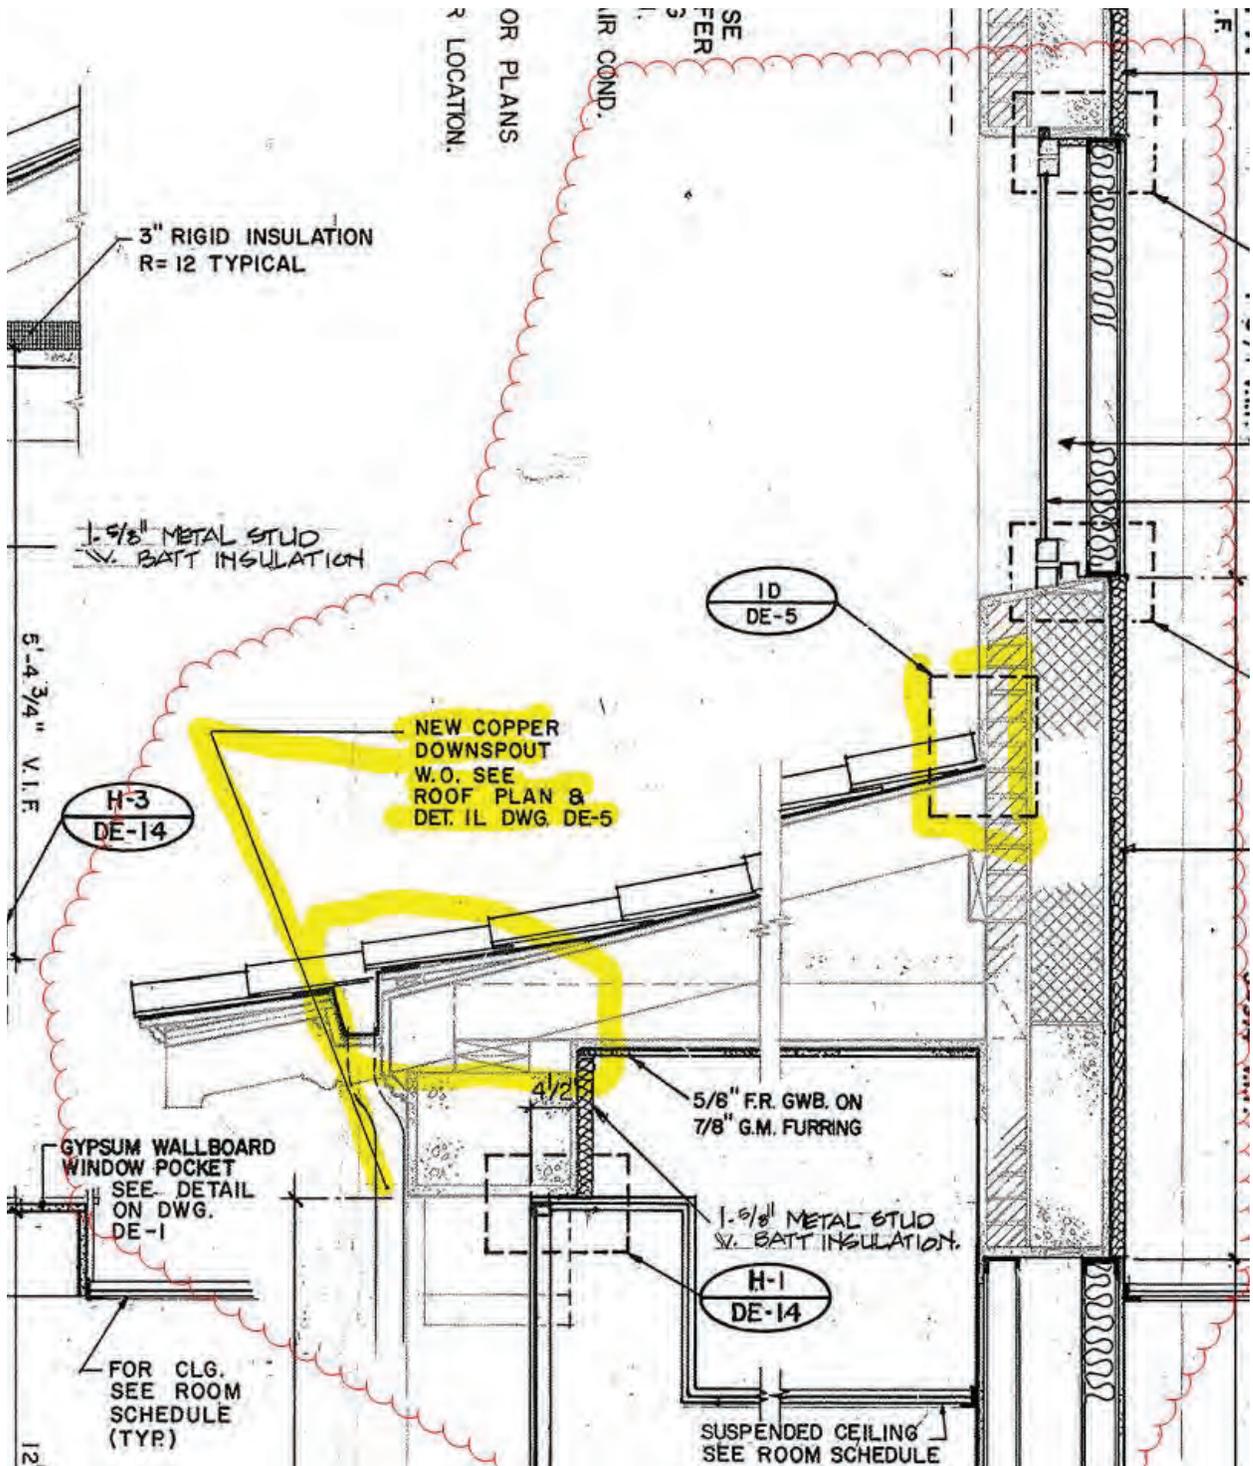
Area B where leaks reported as shown in detail section from 1983 renovation drawings.
